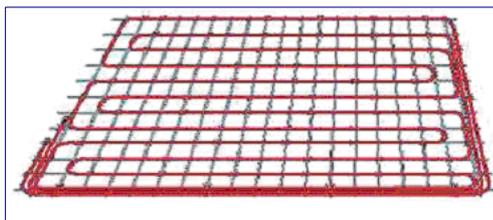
The pipe coil module supplied to be embedded in a concrete slab on-site
